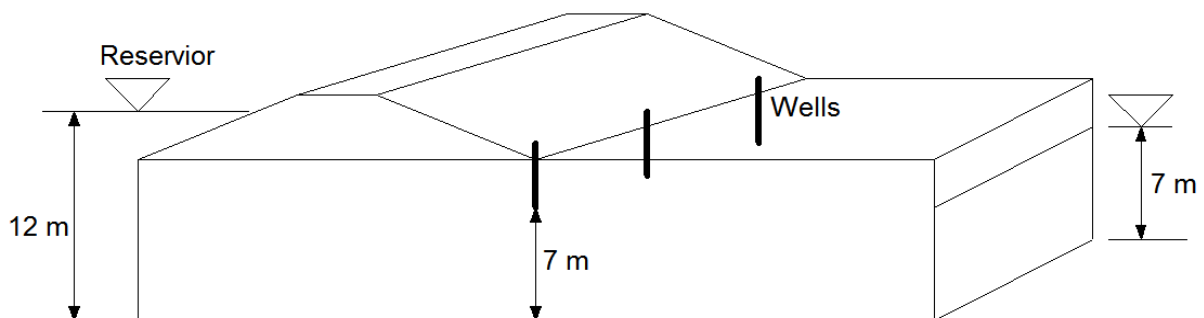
Typical section of earth dam with relief wells at the toe of dam.
